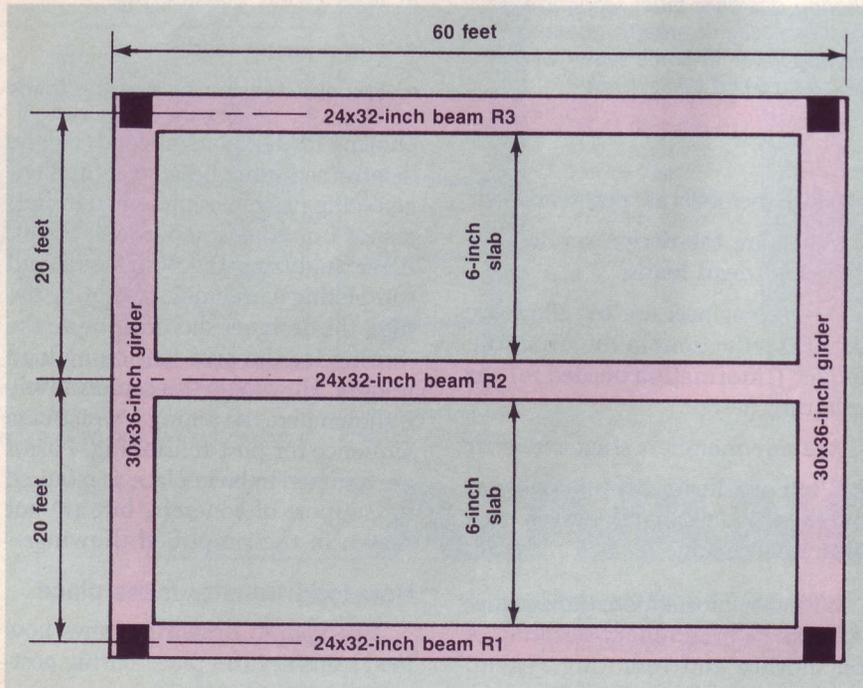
Floor plan (not to scale) of typical beam and slab structural bay used in the text example to explain load transfer during post-tensioning.
